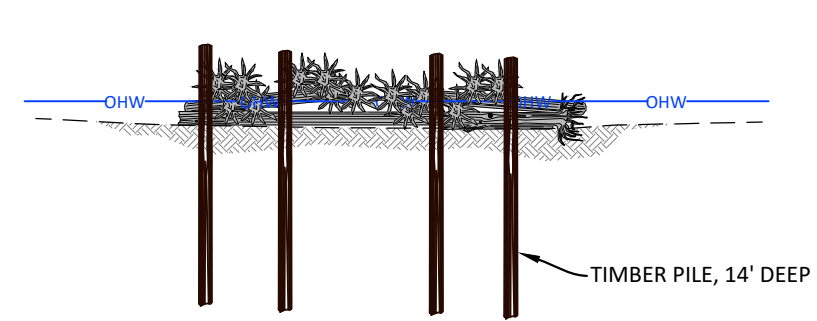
DETAILS - TYPICAL HELICOPTER PLACED STRUCTURES
